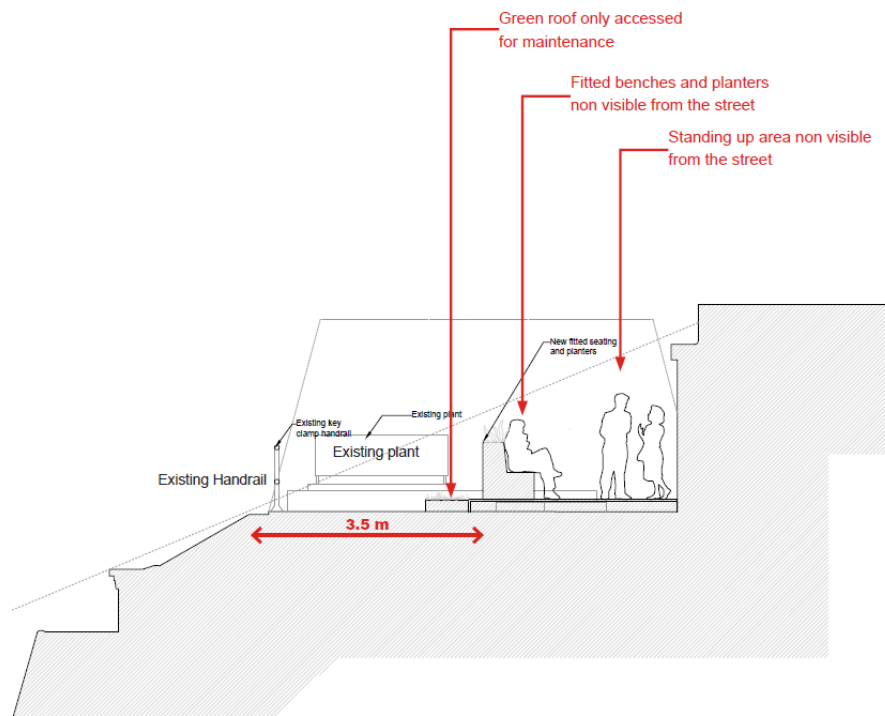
Proposed Roof Section (Source: Design and Access Statement, prepared by White Red Architects)
